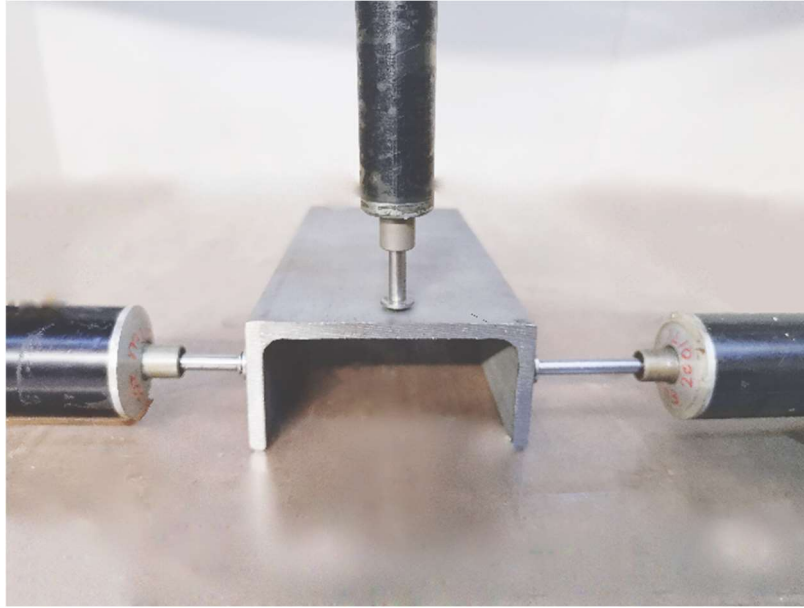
Test setup for initial local geometric imperfection measurements.
